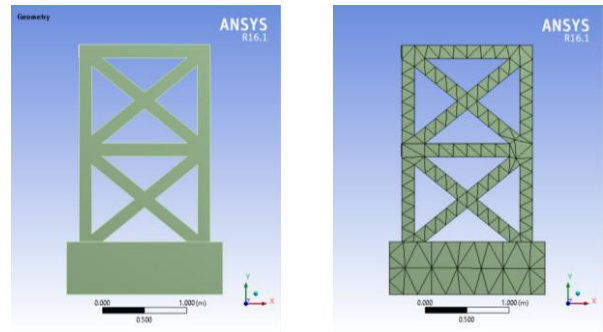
RC frame with Diagonal strut and Meshing of RC frame with Diagonal strut
